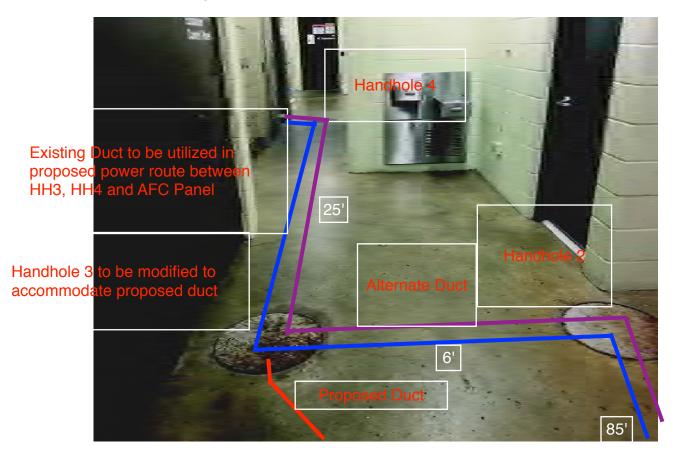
Existing and alternate duct feeding AFC Panel in Room 126
